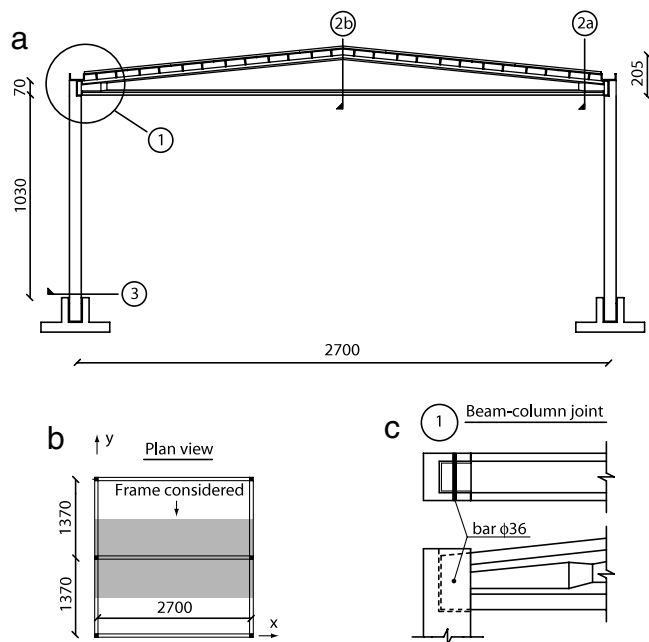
The structure at study: (a)–(b) front and plan view; and (c) detail of the beam–column joint (units cm, ϕ in mm).
